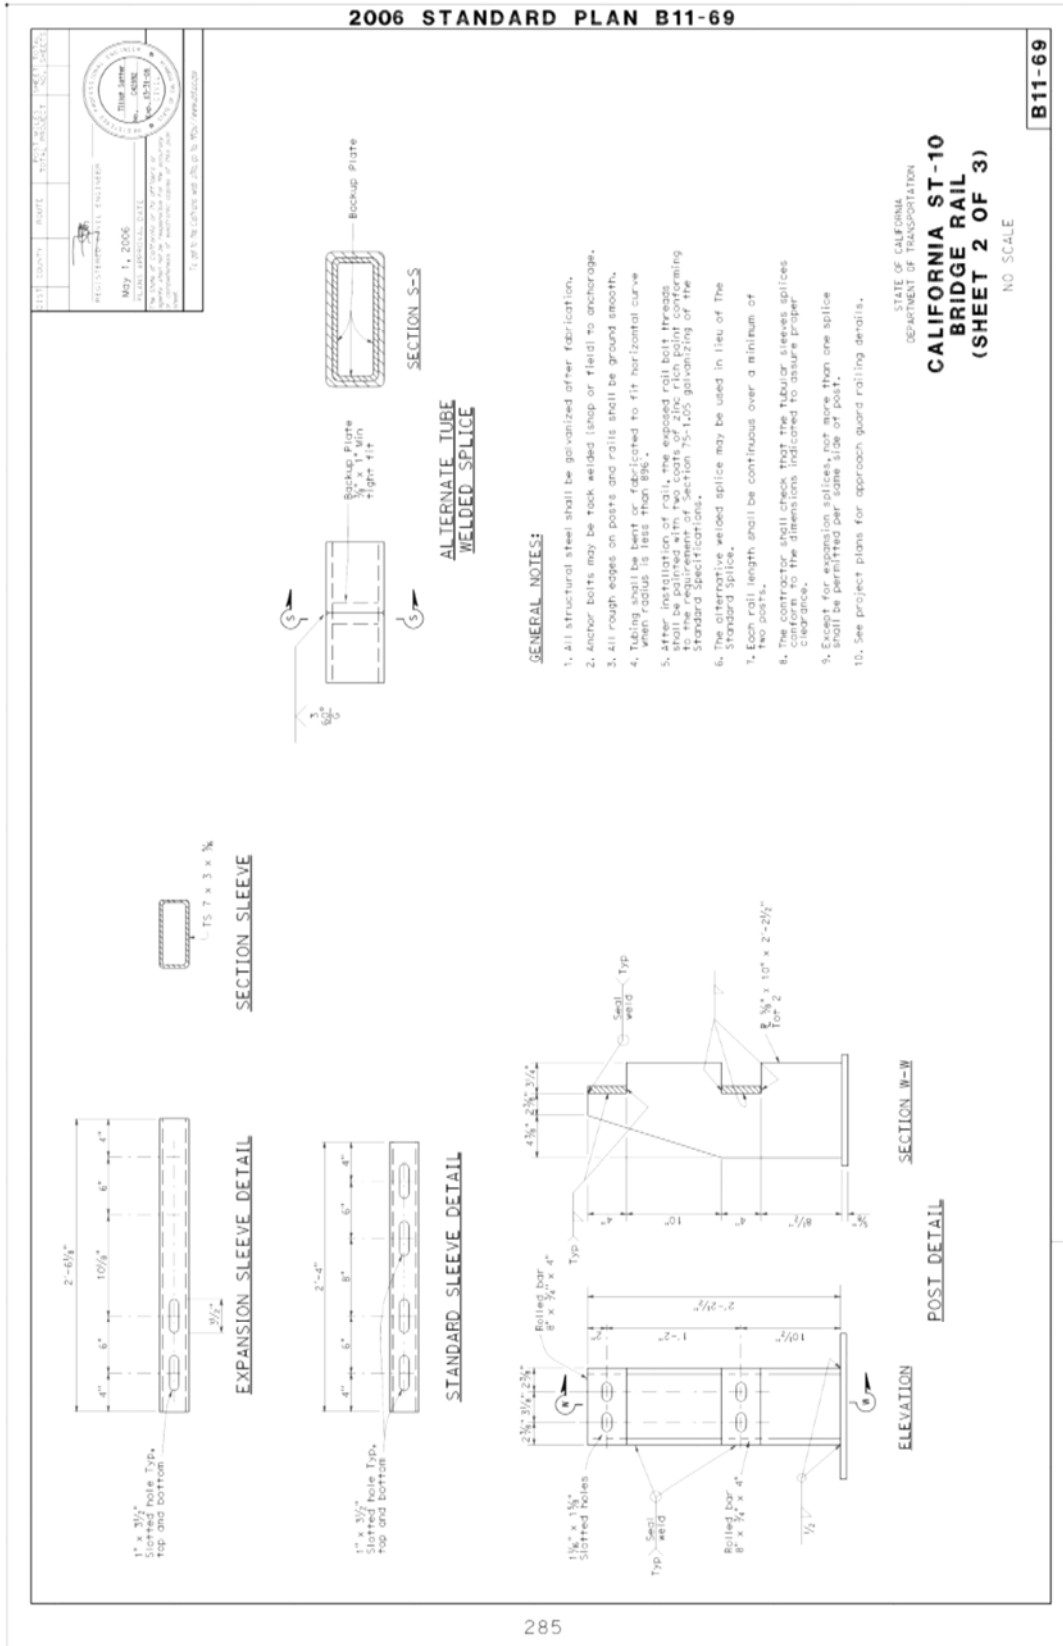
California Standard Plan for the ST-10 Bridge Rail Sheet 2 of 3
